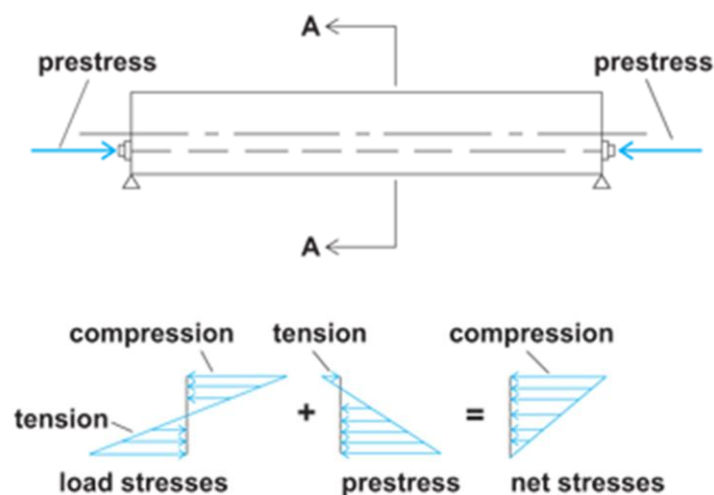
Stress distribution for prestressed concrete section (Ghaffar, 2008)
